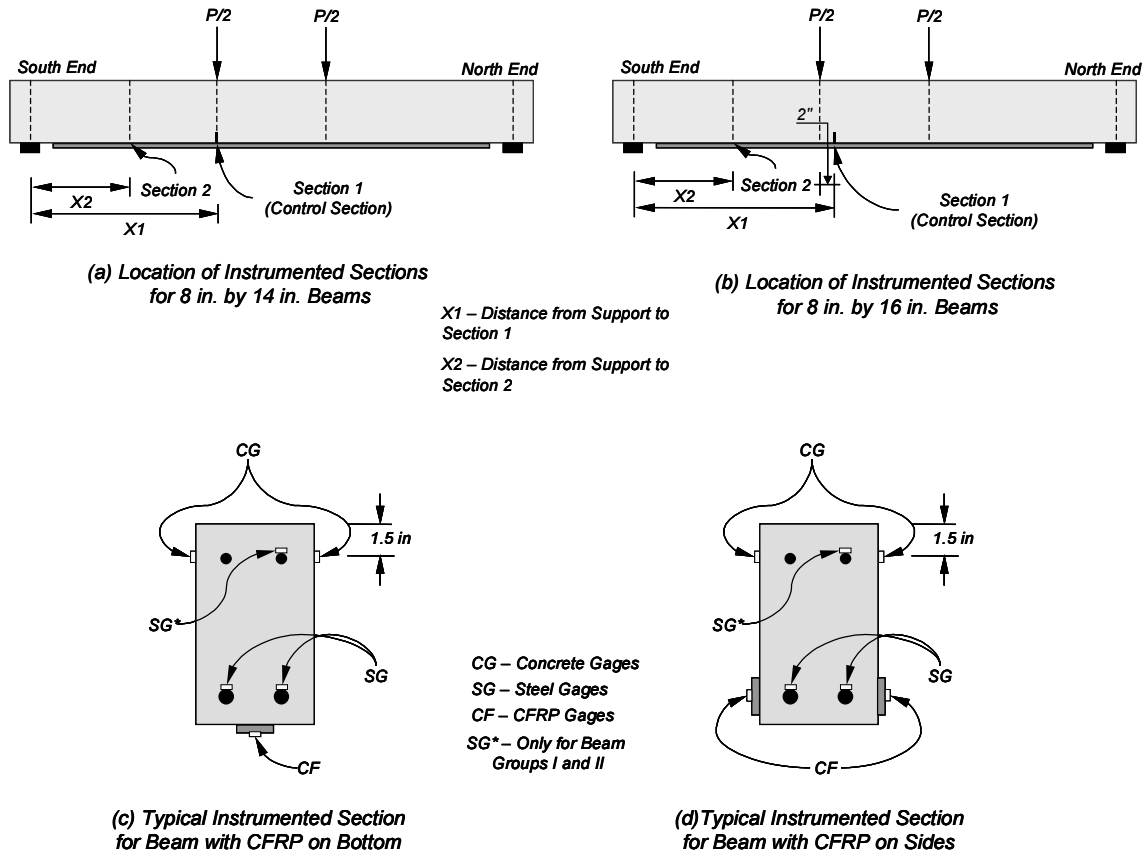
Location of Instruments in Rectangular Beam Specimens
